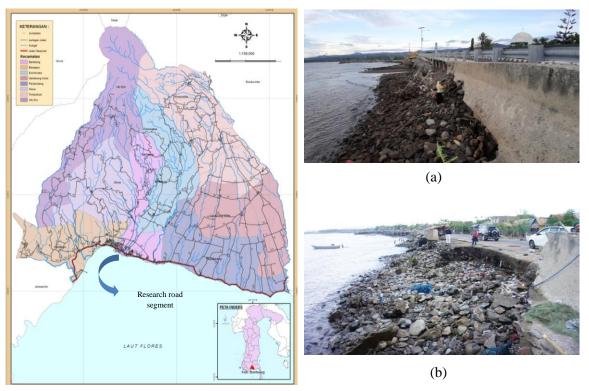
Location of coastal road, a. Damage conditions for road embankments in Pallantikang Village, b. Damage condition of the road embankment in Tappanjeng Village
